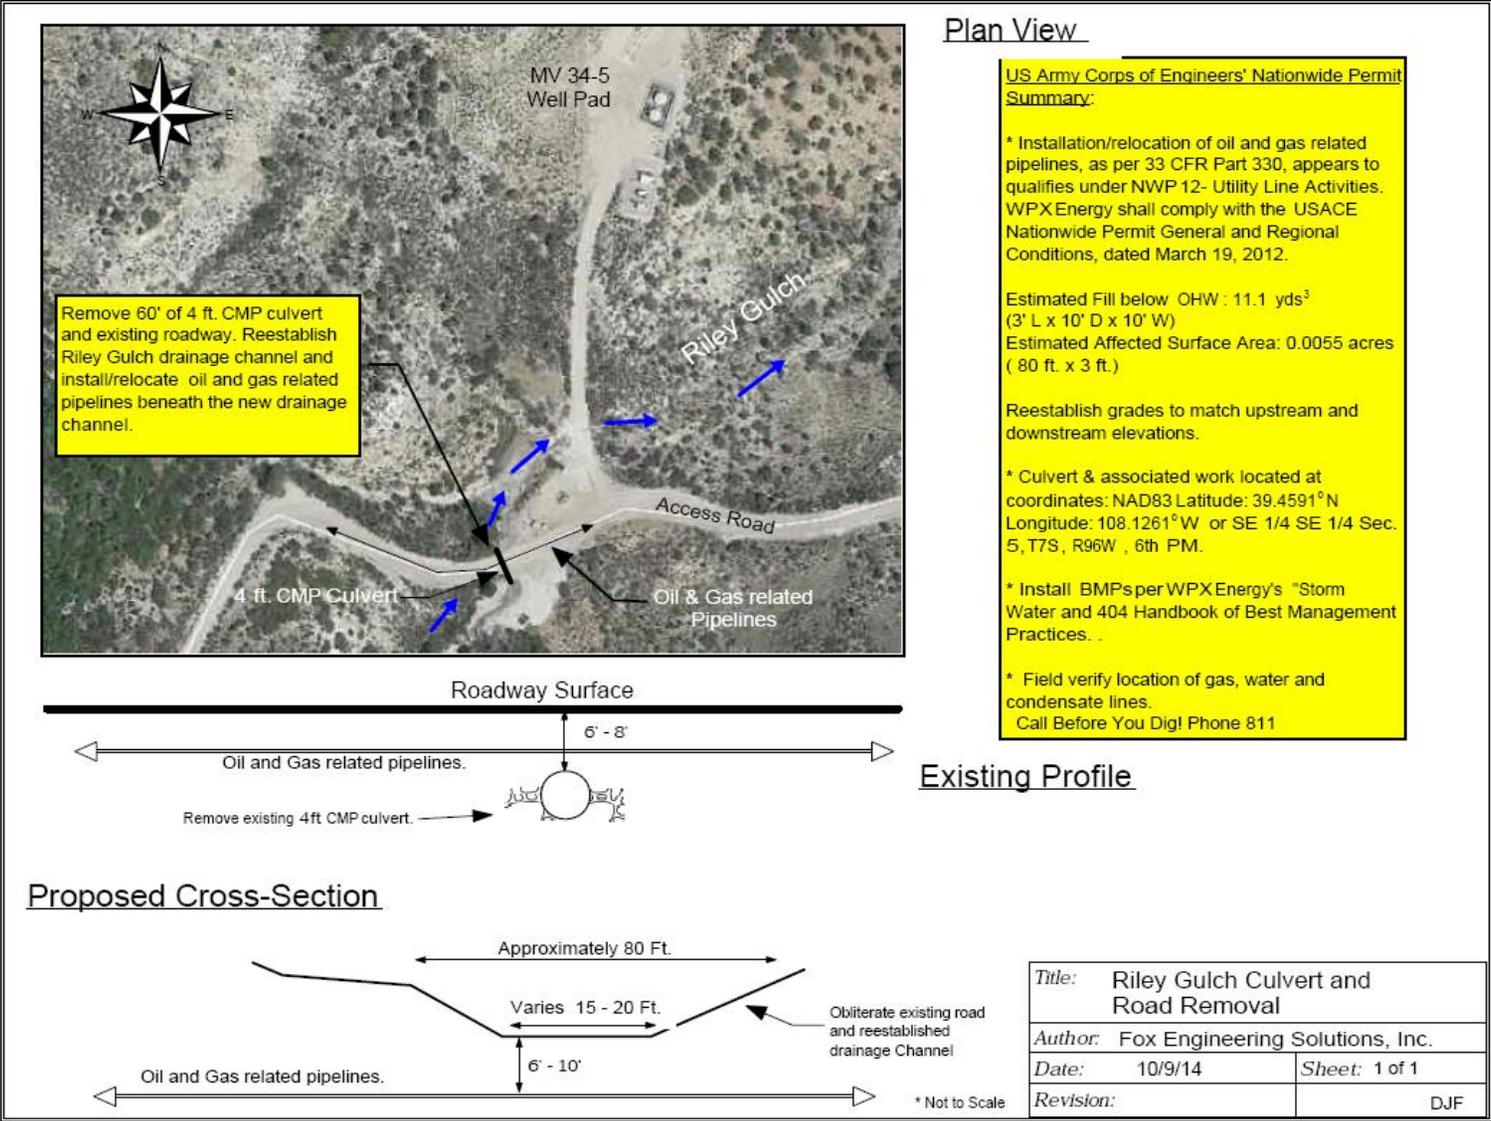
Road and Culvert Abandonment in Riley Gulch South of MV 34-5 Pad.
